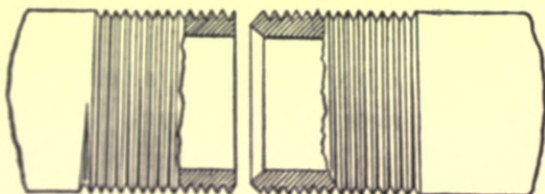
Method of Joining Pipes for High-pressure Heating.
